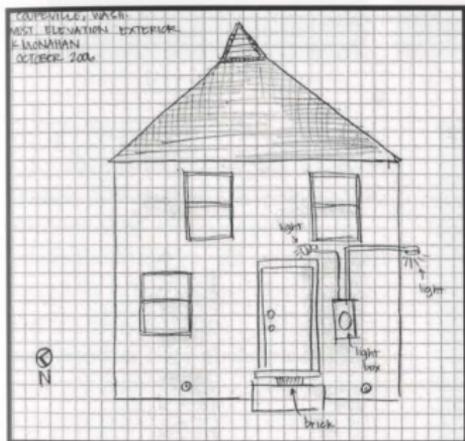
Character Sketch of the western elevation showing rough placement of door, windows, and electrical elements.
